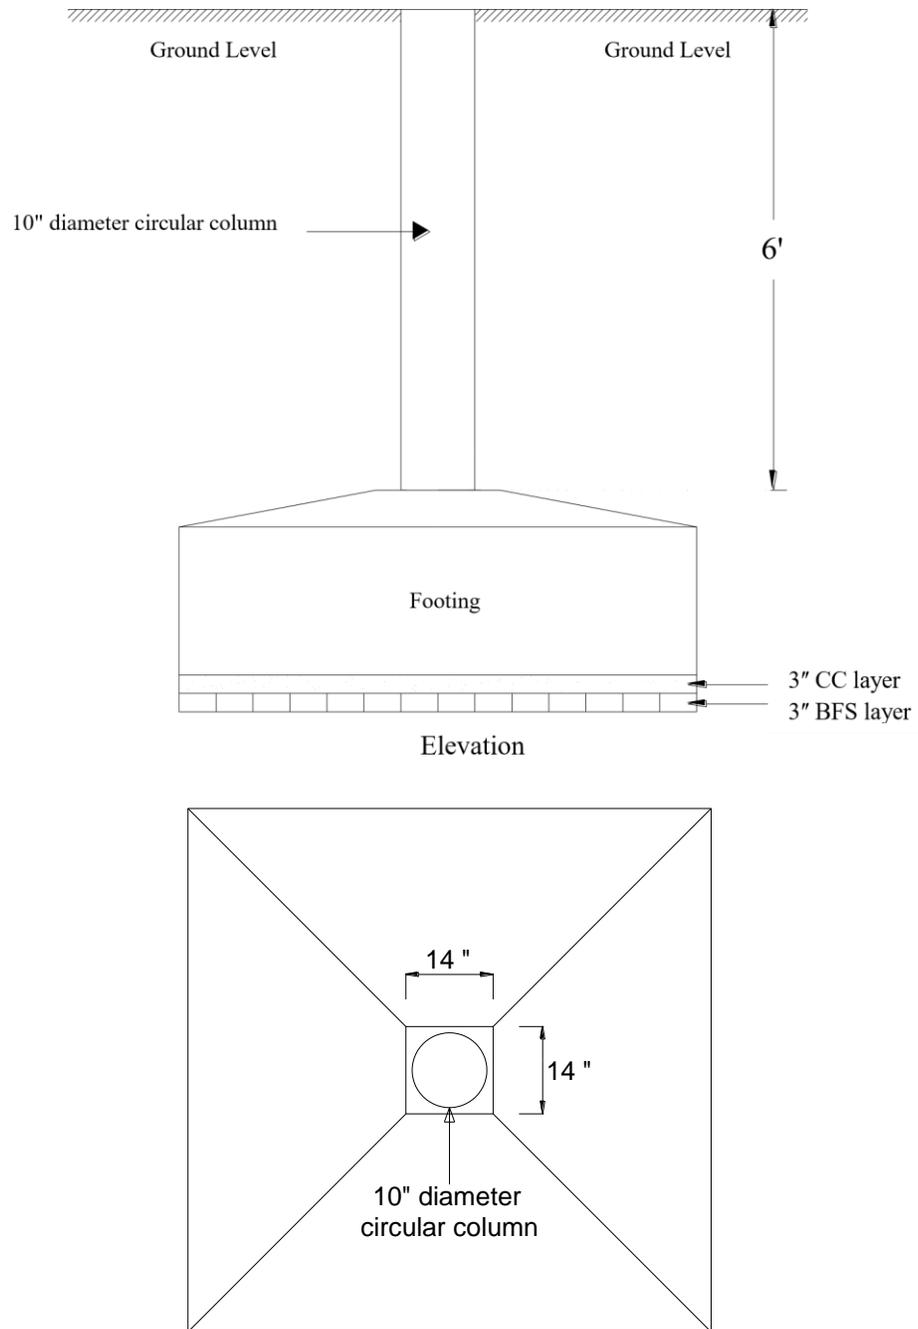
Plan and Elevation of Foundation for Question 7 of Assignment
